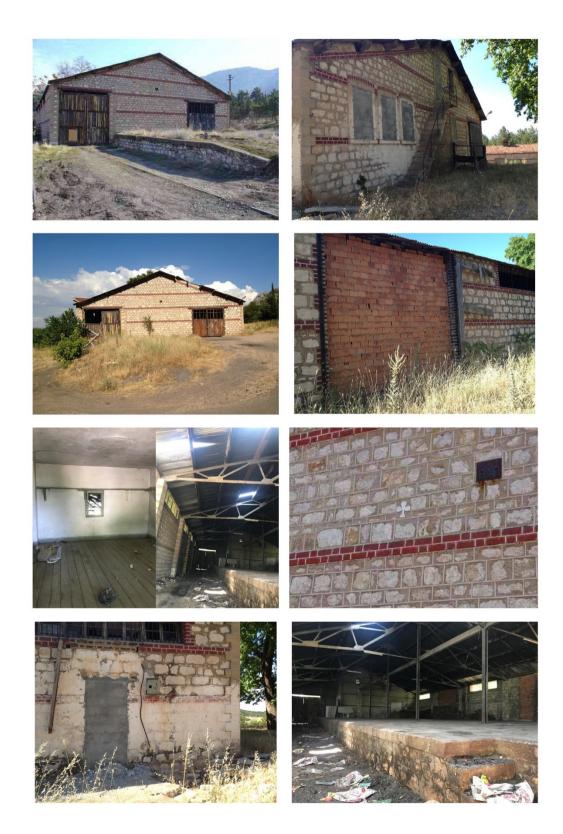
Photos of Warehouse Building (Sinan, 2019)
